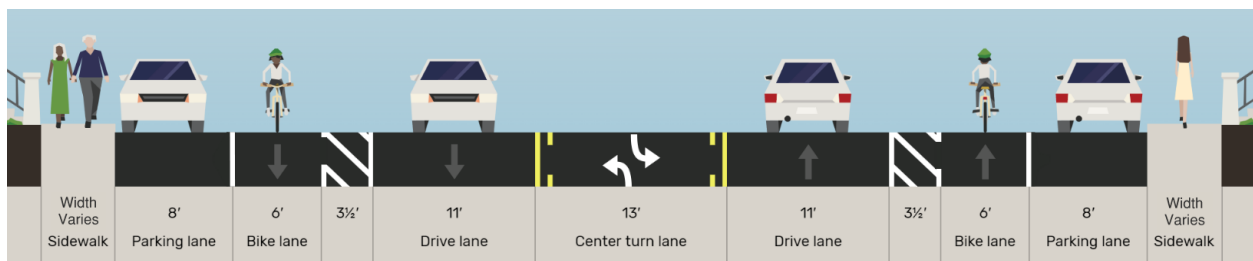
Miramonte Avenue Sample Road Diet Cross Section
